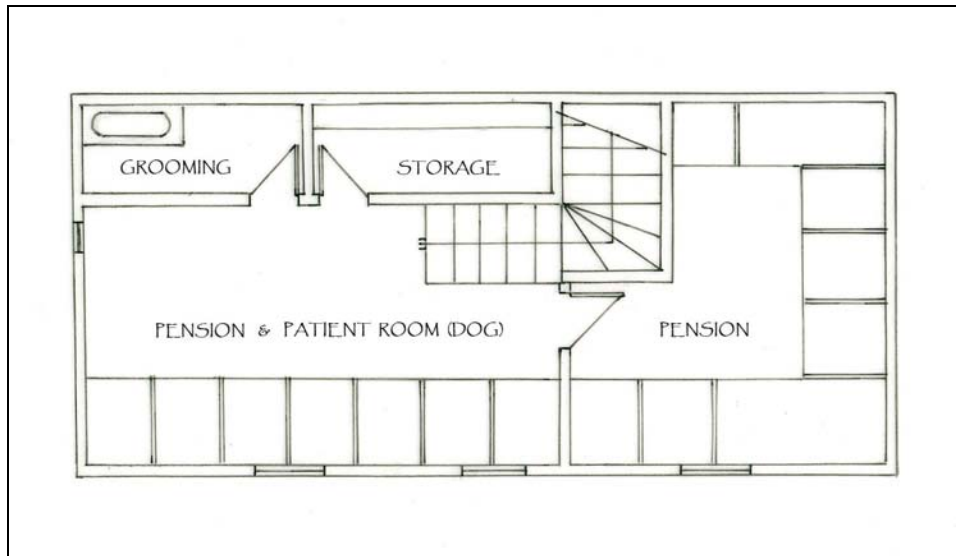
Basement Floor Plan of Beysukent Veterinary Clinic
